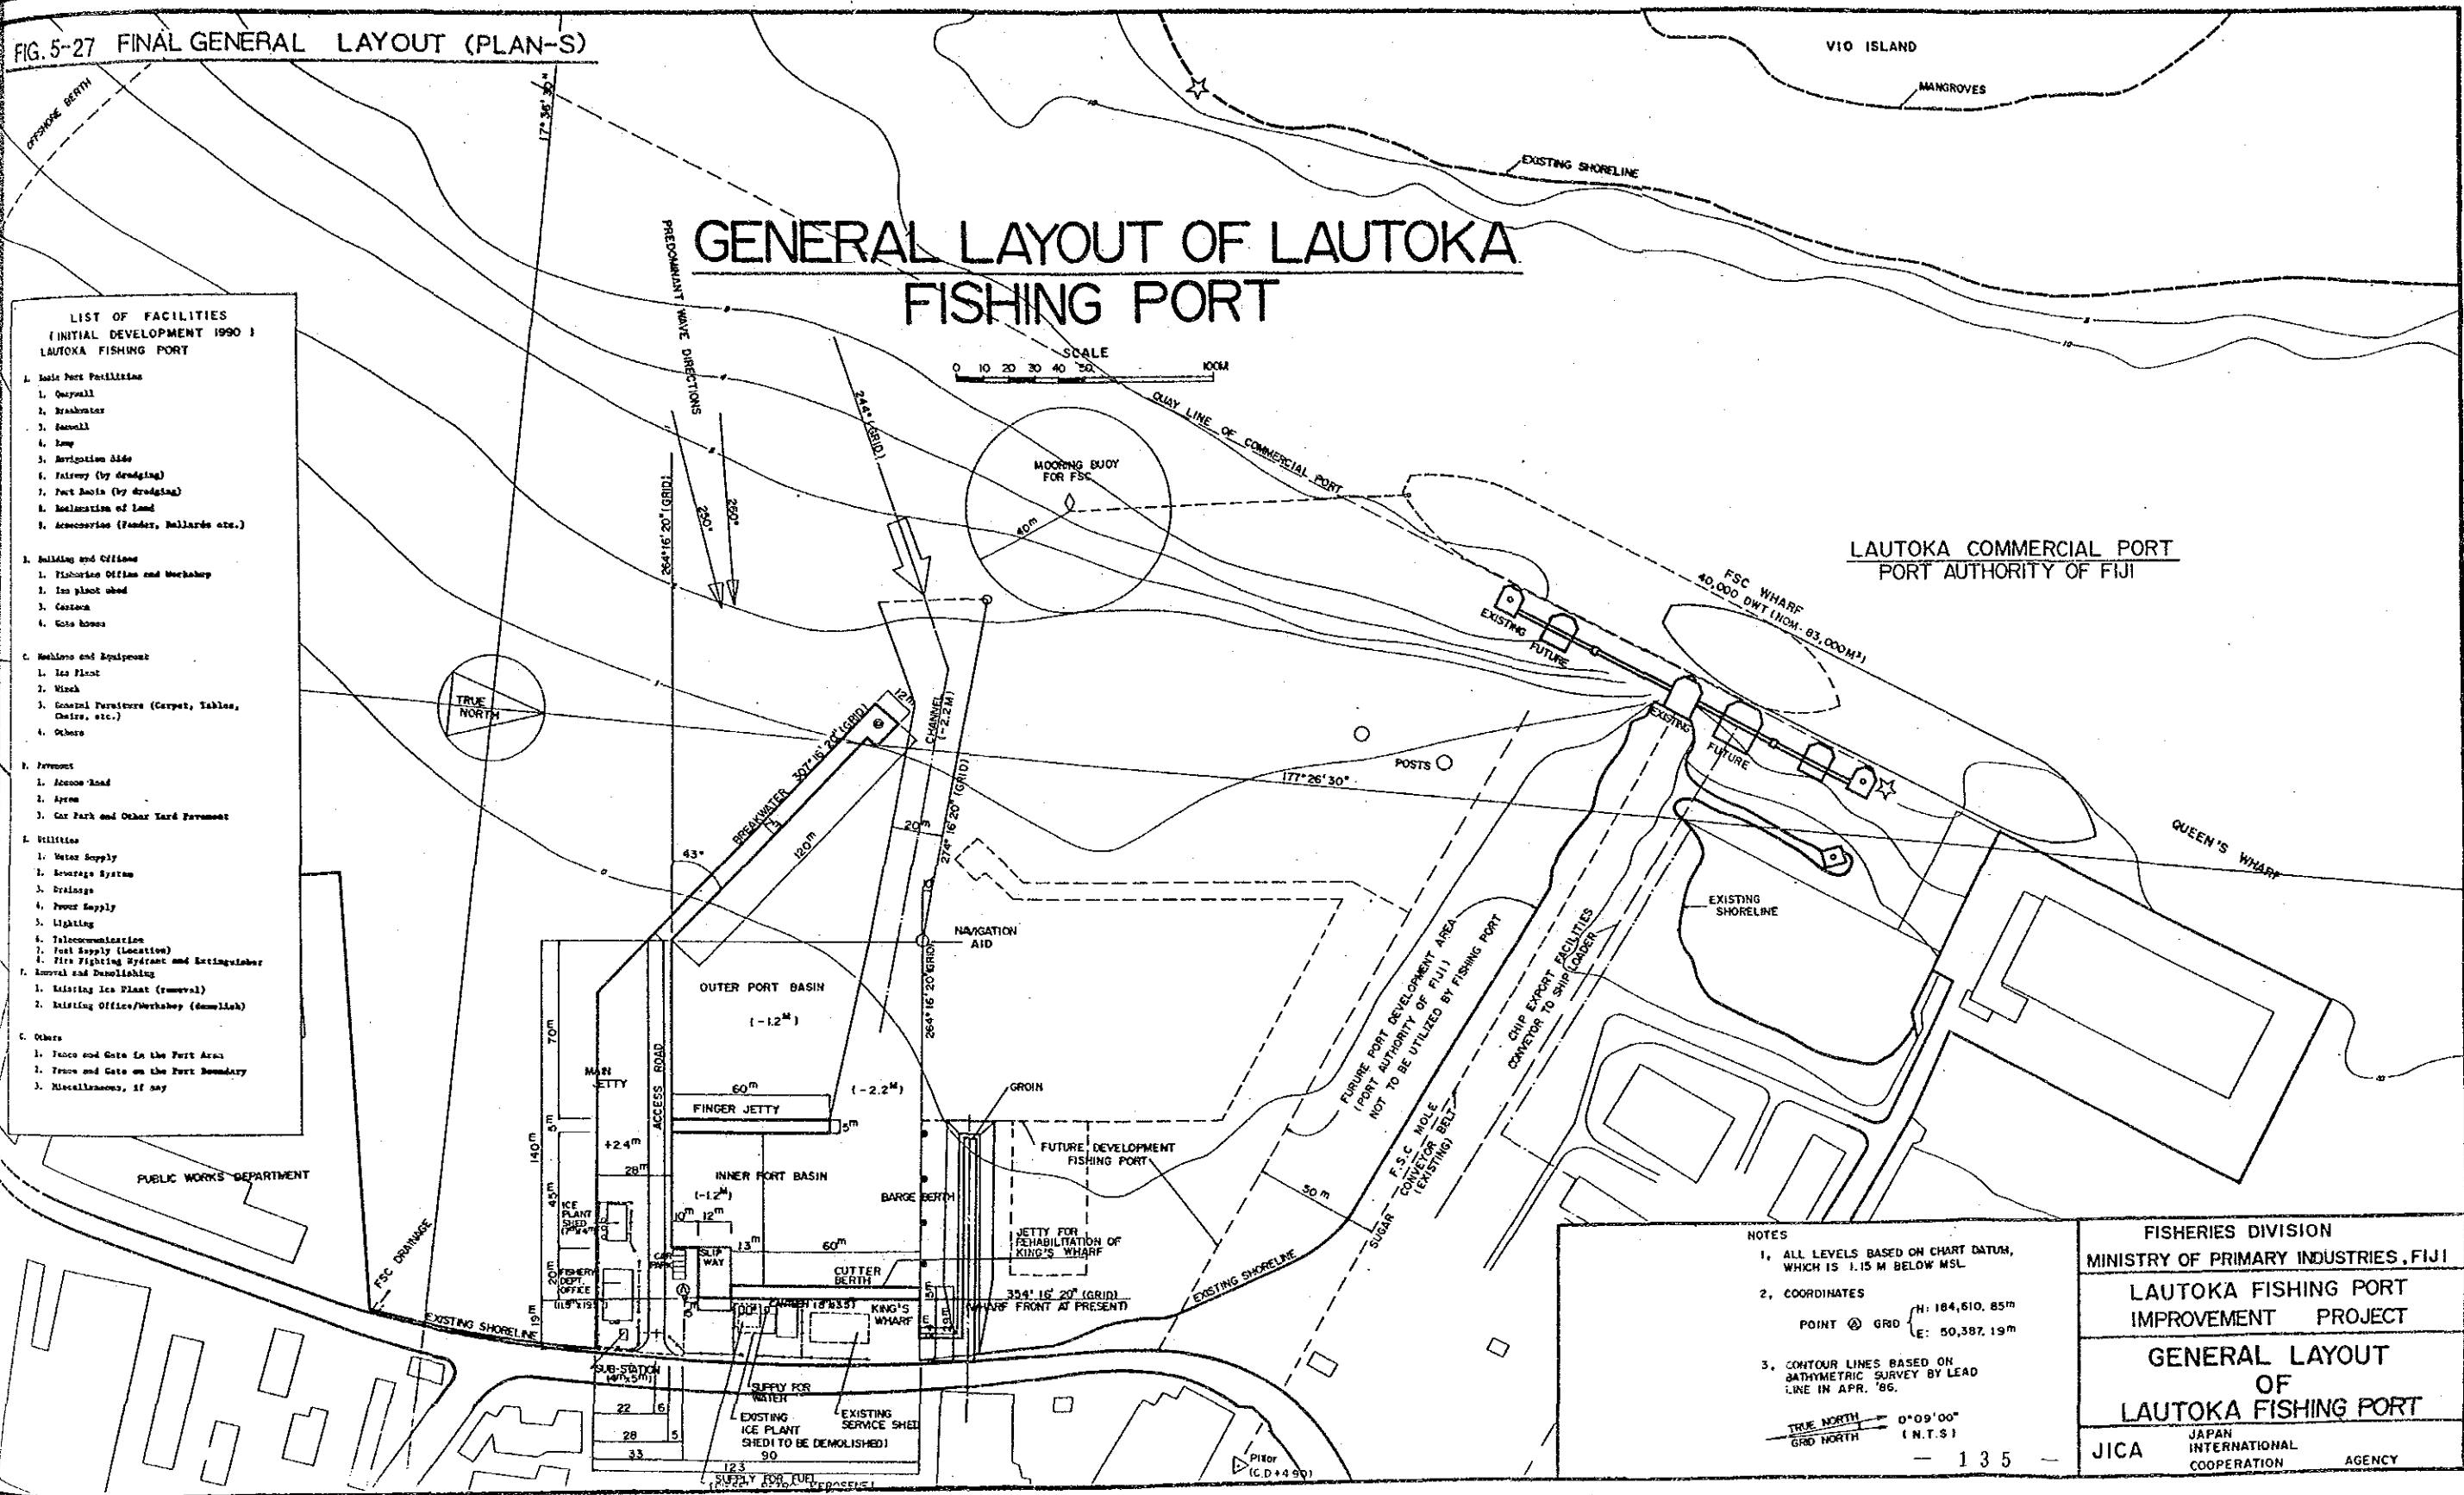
FINAL GENERAL LAYOUT (PLAN-S)
